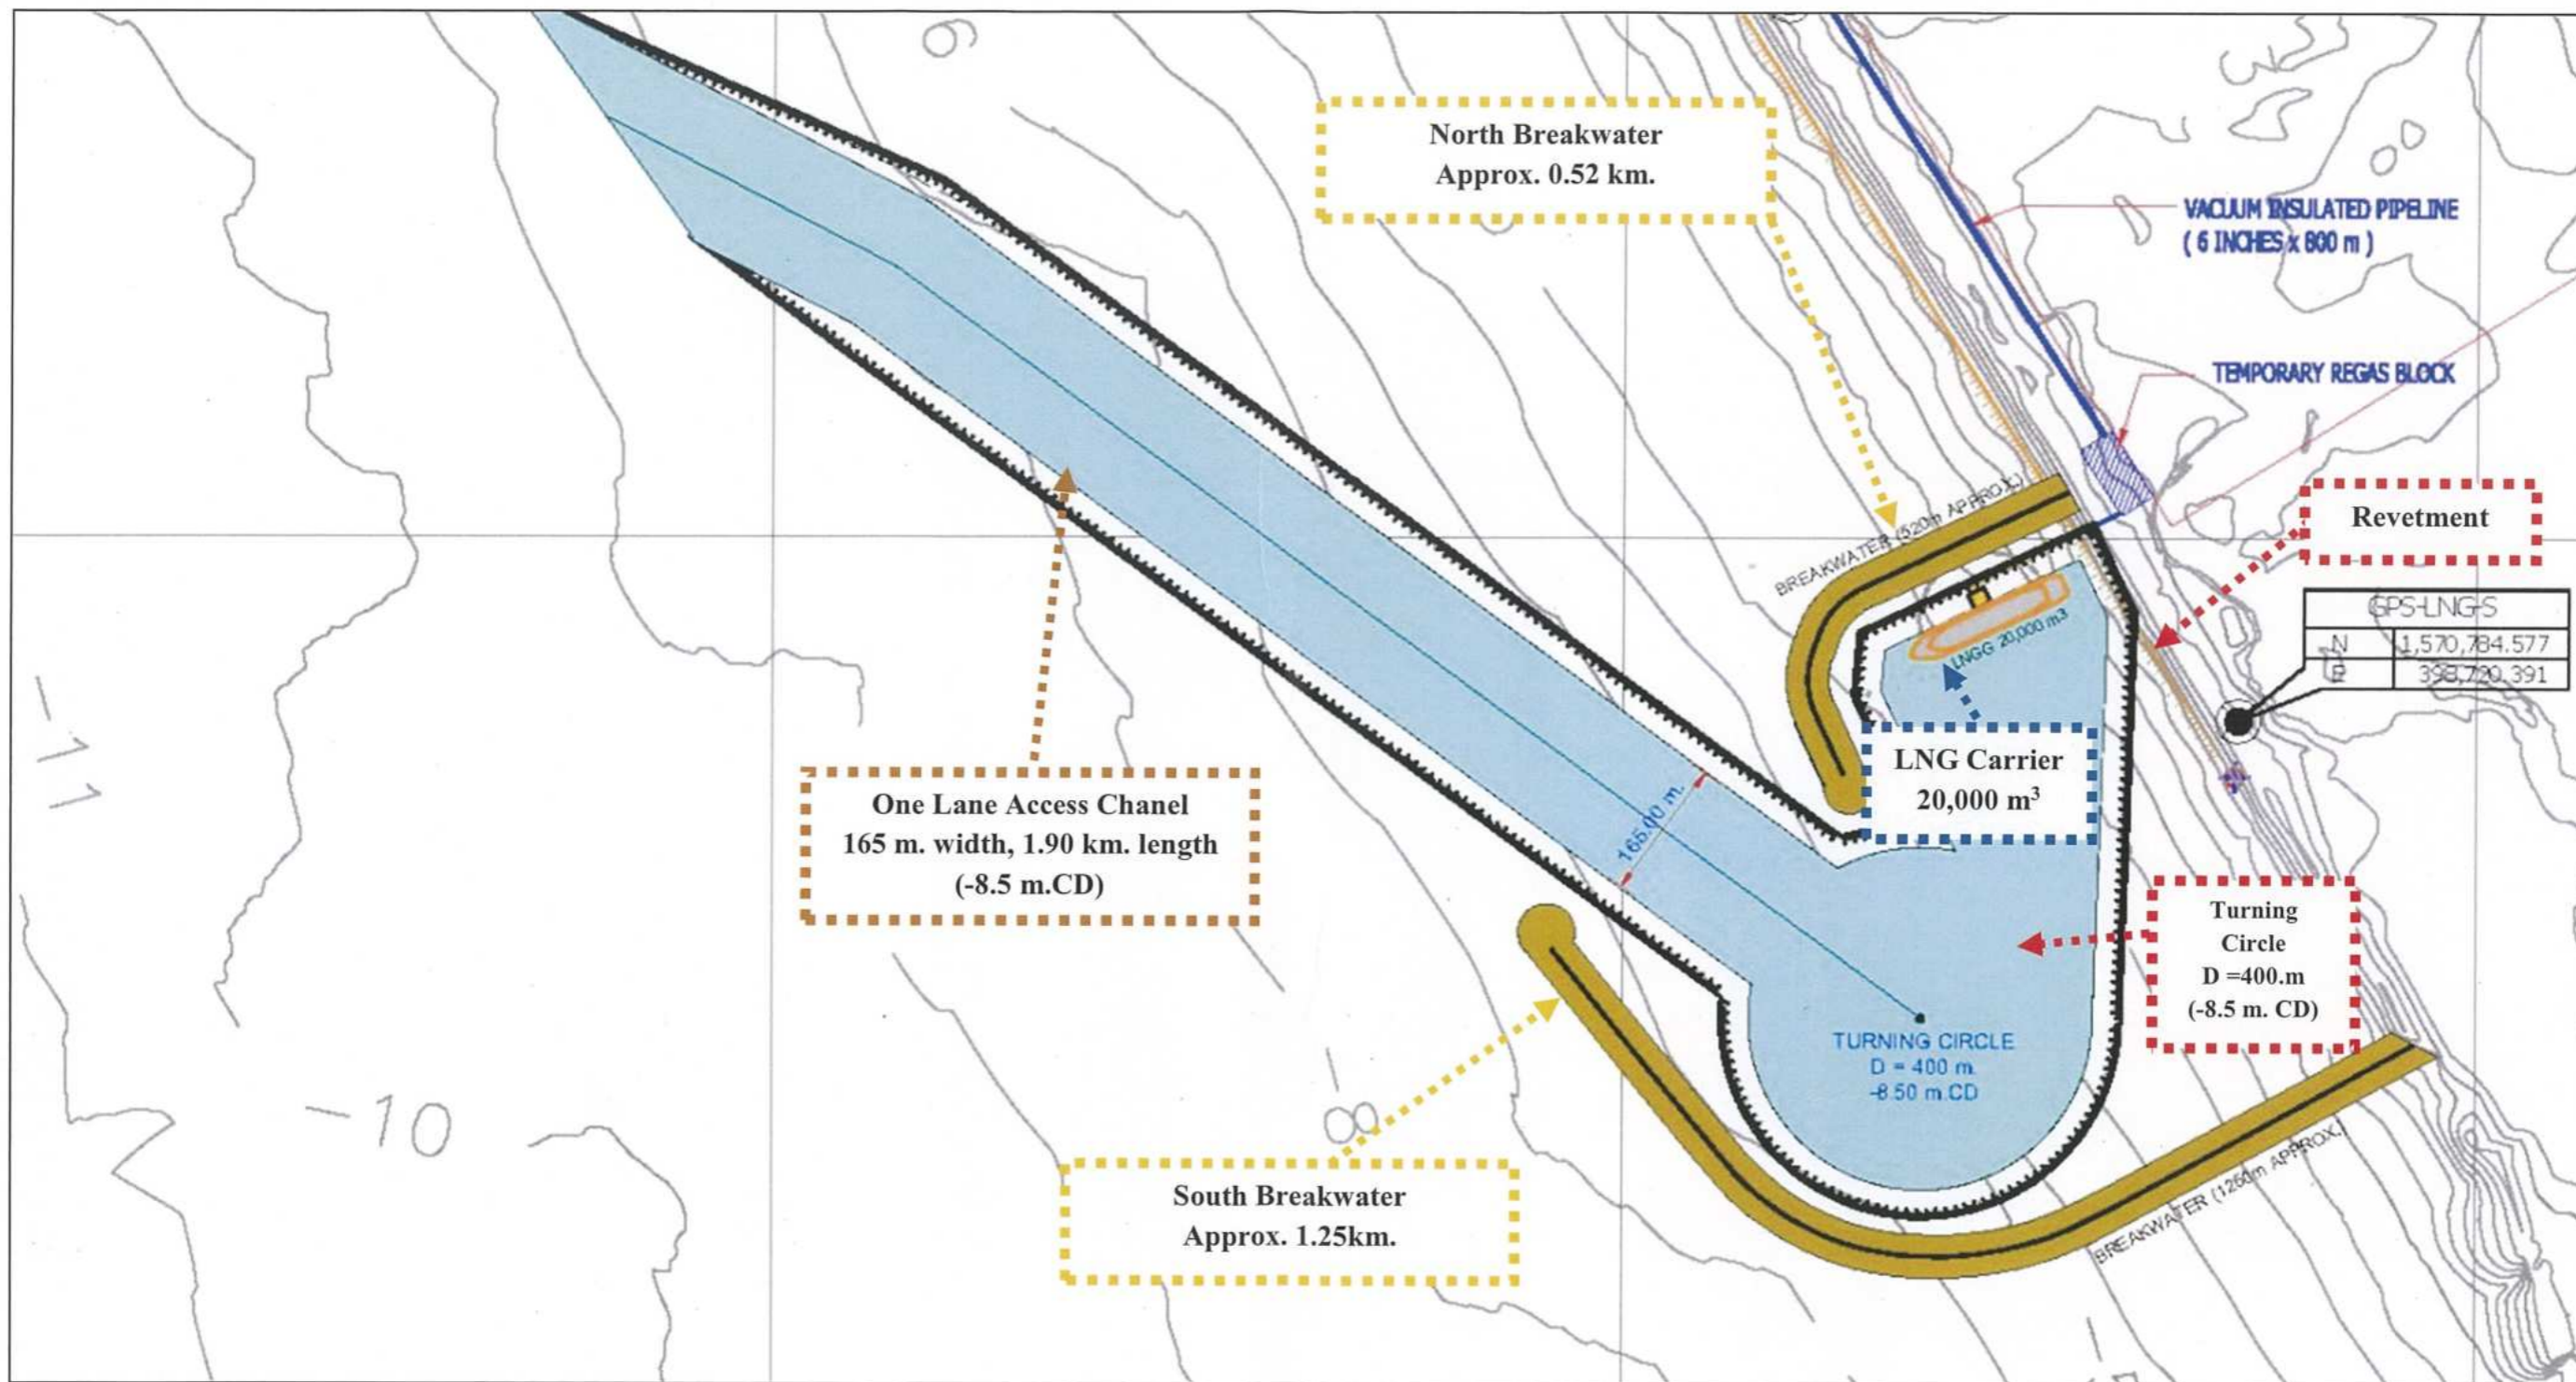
LAYOUT OF OFFSHORE FACILITIES
